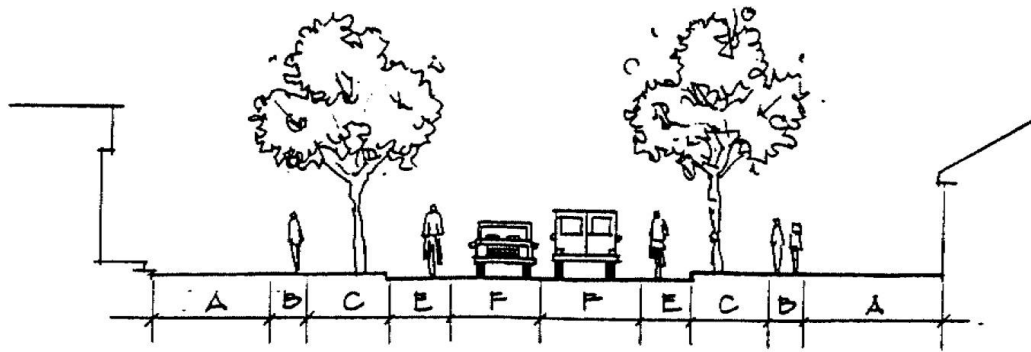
Schematic sketch of a typical sub-collector street cross-section. Table 7-1 lists the recommended dimensions of each component: A) building setback from street right-of-way; B) walkway; C) planting area; E) bicycle lane; F) travel lane.
